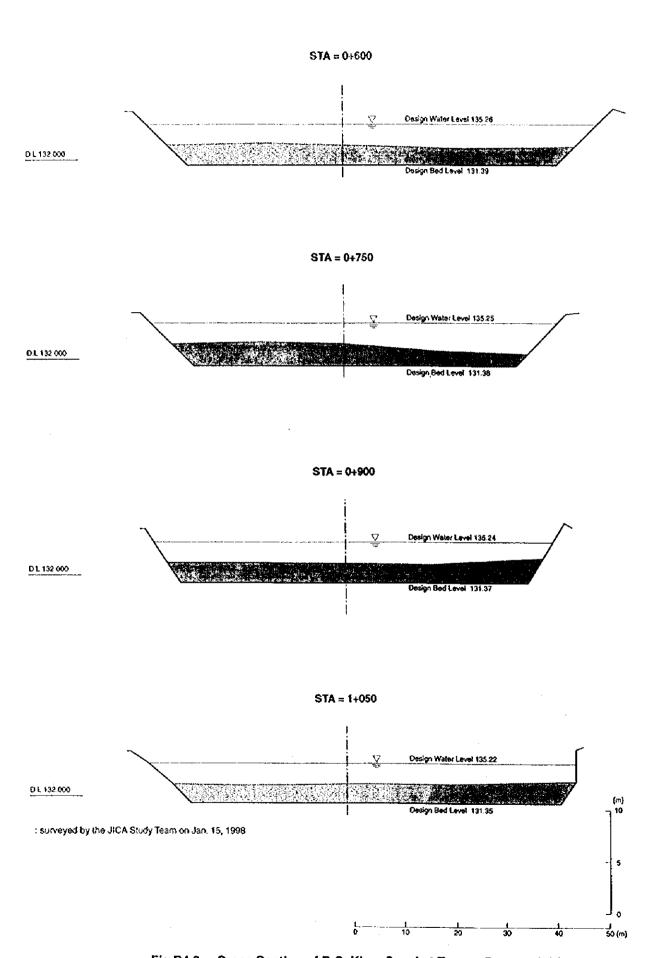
Cross Section of D.G. Khan Canal at Taunsa Barrage (2/4)
